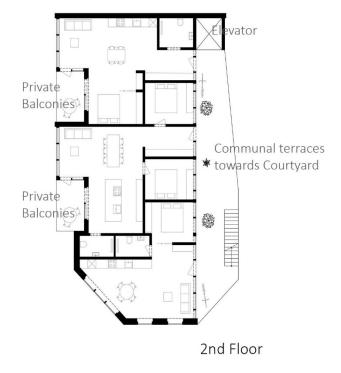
Floorplans of addition at Frederiksborggade, Scale 1:250 (A4)
